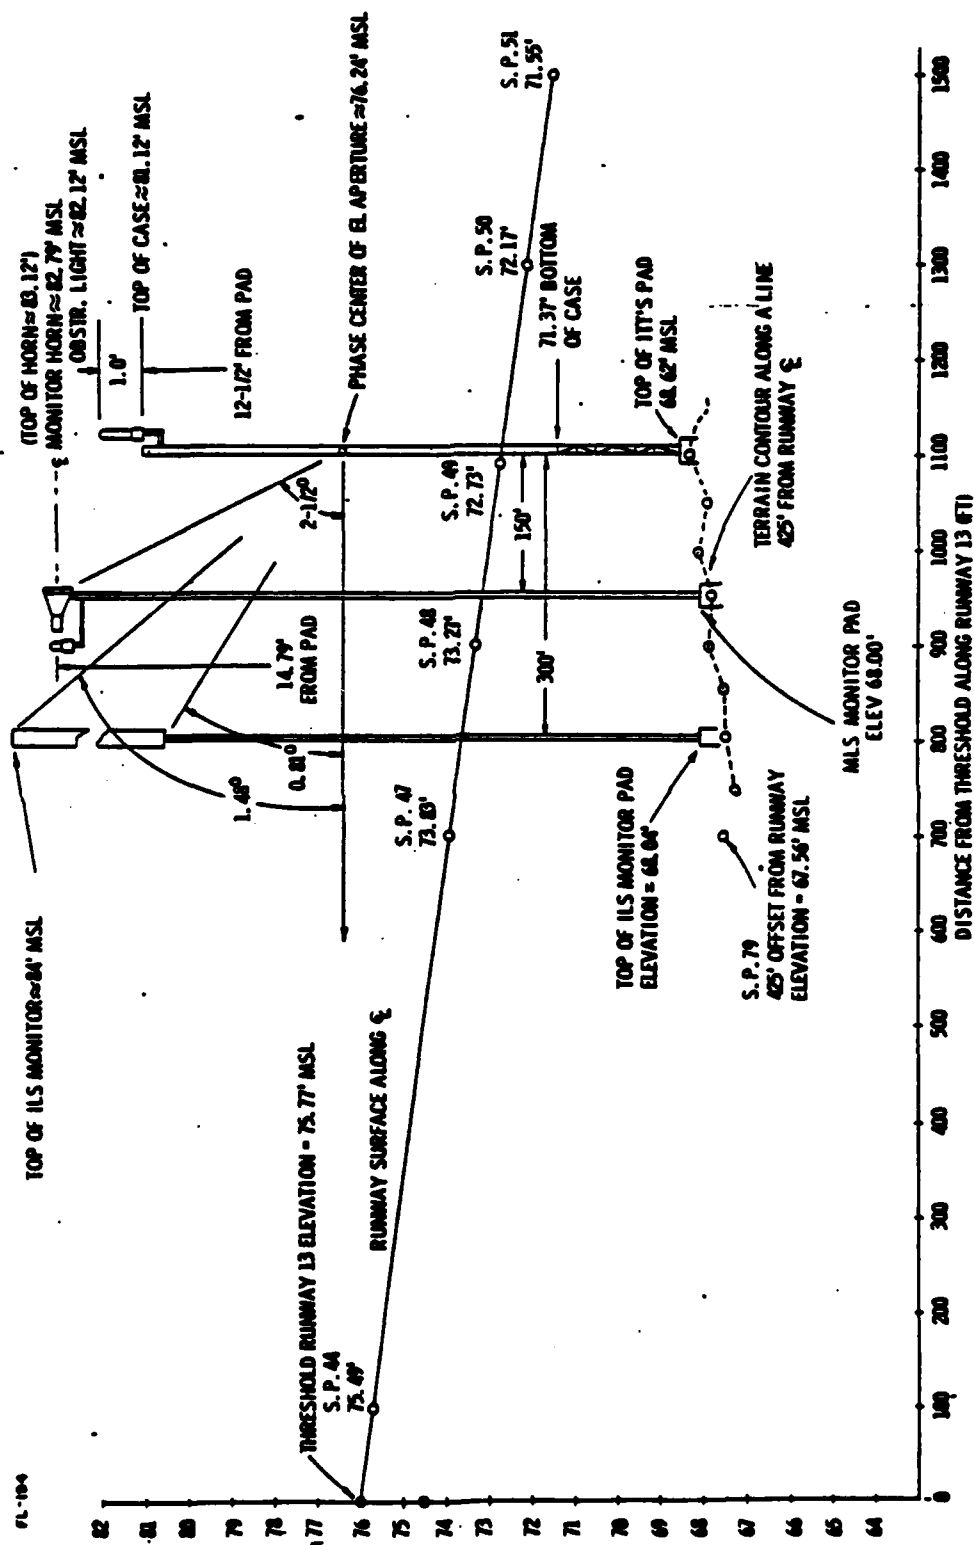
BN EL SITING (ELEVATION VIEW), RUNWAY 13
